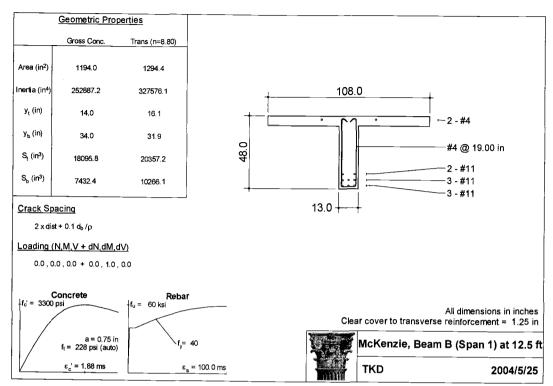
McKenzie R. Bridge; Span 1 at 12.5 ft. (RESPONSE 2000TM)
